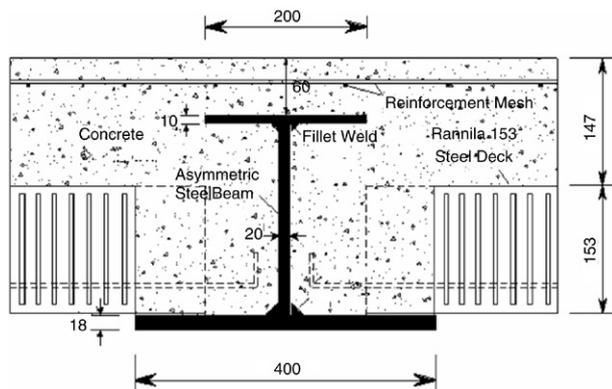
Section shape of the Finnish asymmetric slim floor beam.
